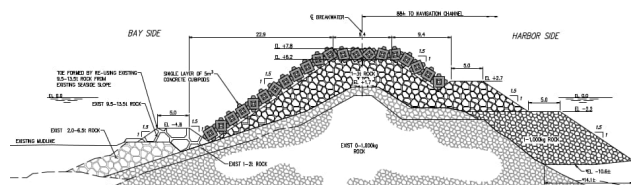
Carmel BW Retrofit 5 m³ single-layer Cubi-Pod armor at trunk.
